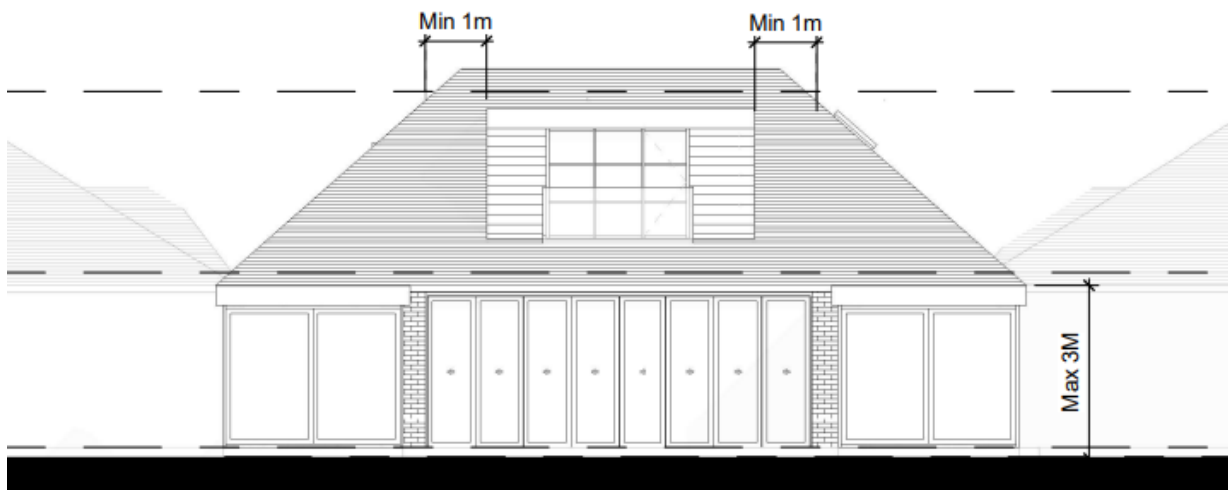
Roof Extensions at No: 7 Elmbridge Close
